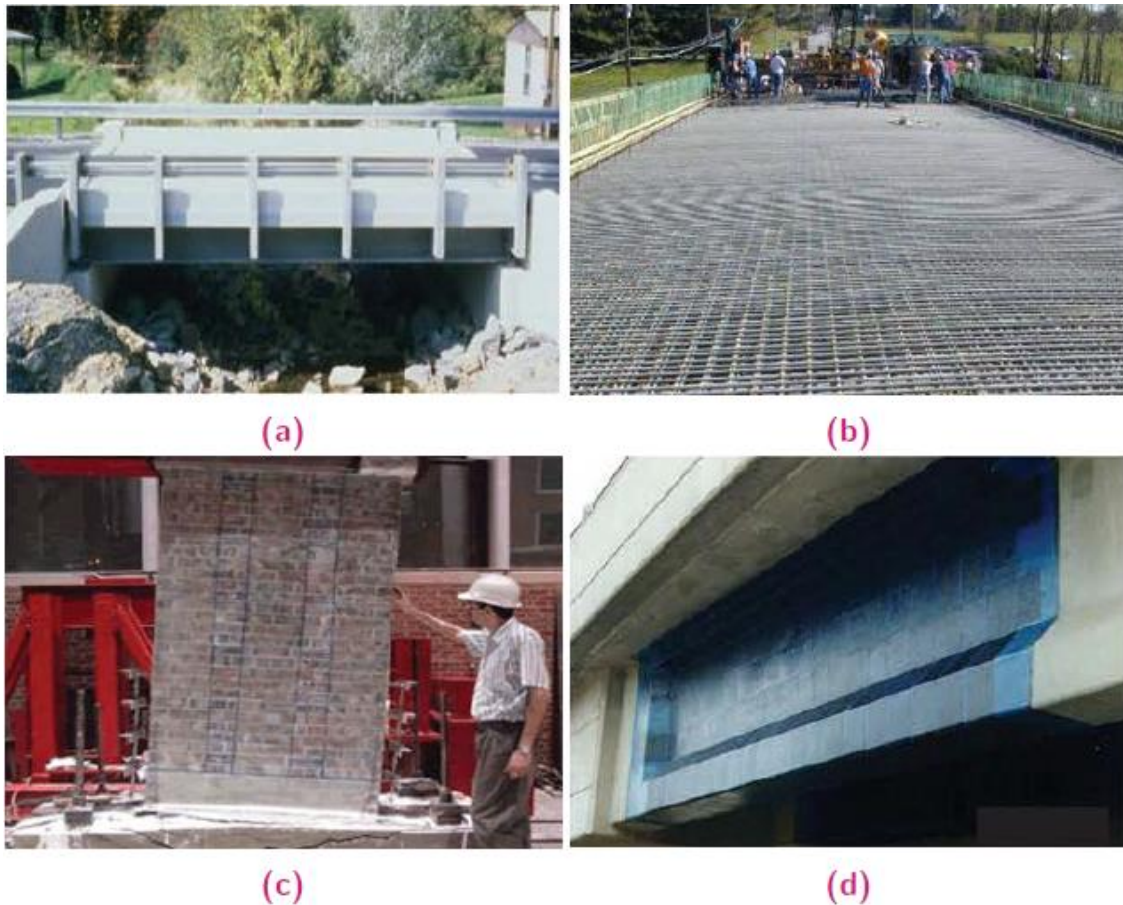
Applications of FRPs in Civil Engineering (a) A short-span FRP road bridge, (b) GFRP reinforcing bars placed in a concrete bridge deck, (c) Strengthening of clay brick masonry wall with EB GFRP sheets, and (d) Strengthening of RC bridge girder with CFRP sheets [11].
